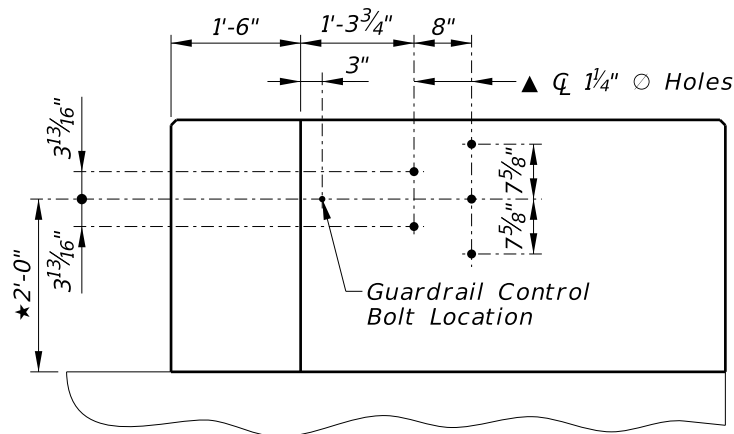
Legacy Rails – Guardrail End Section Dimensions
